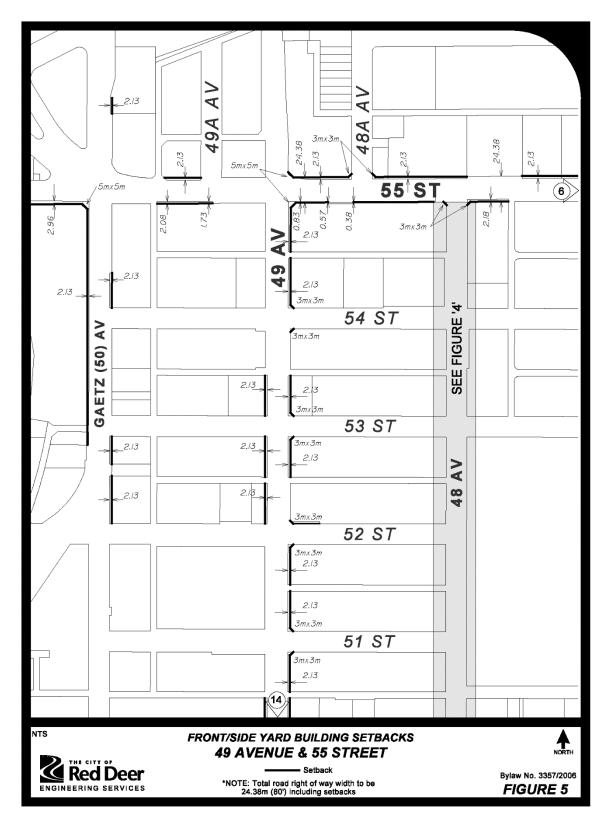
Front/Side Yard Building Setbacks 49<sup>th</sup> Avenue & 55 Street
